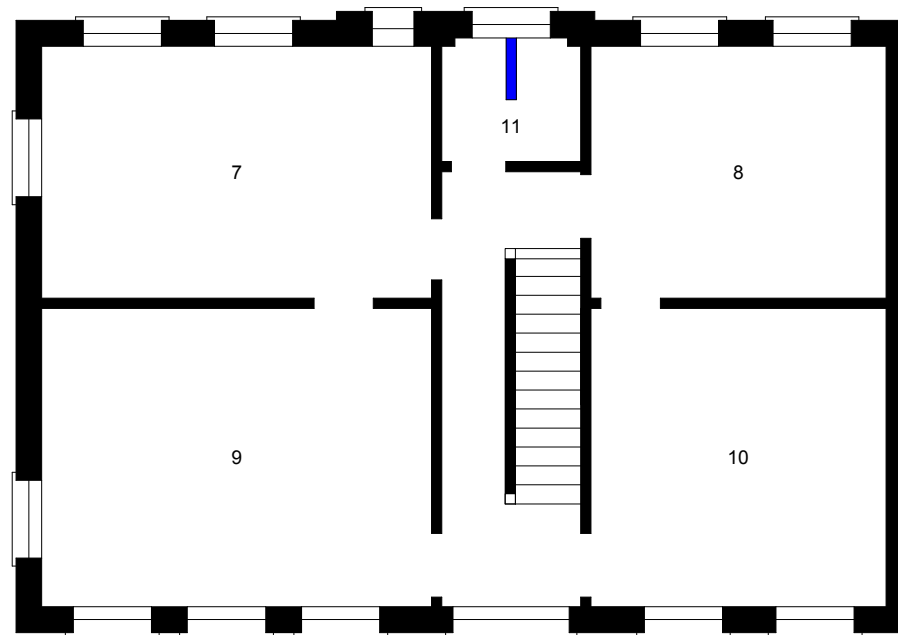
Ground floor plan of FLG 2, with the original fabric shown black.
